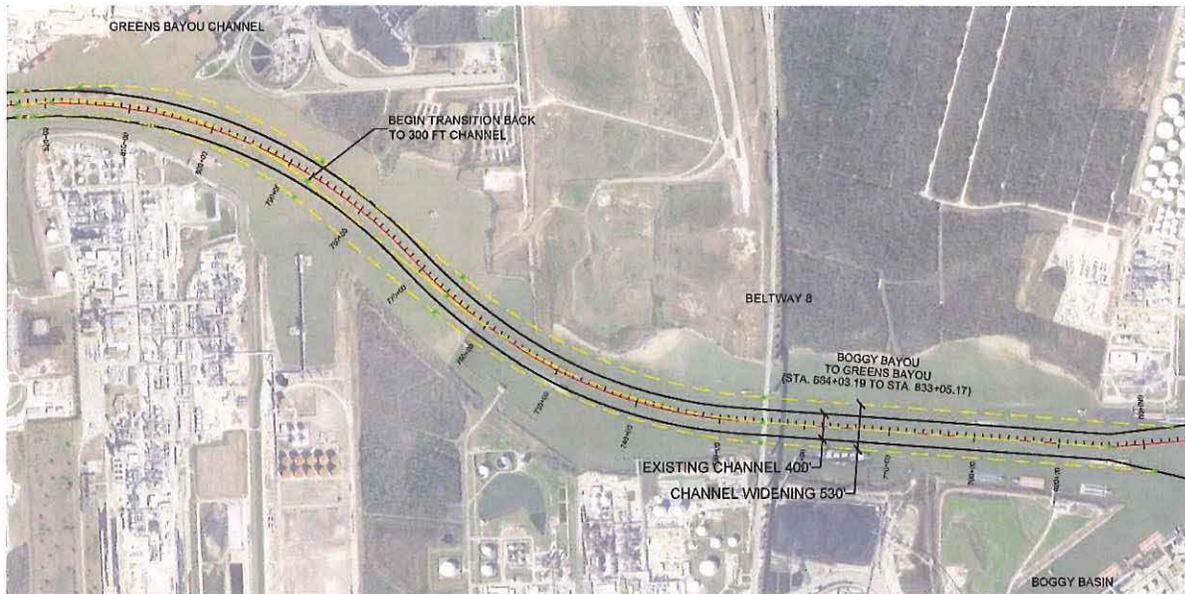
CW4_BB-GB_530 – Bogy Bayou to Greens Bayou Widening 530 Feet
